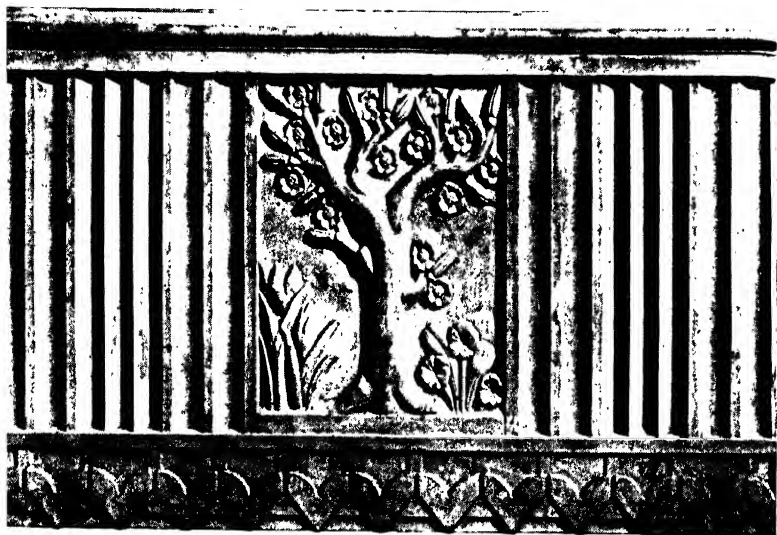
Cast iron window breast panel for Lothian House, Edinburgh. Architect: Stewart Kaye, A.R.I.B.A. Sculptor: Pilkington Jackson. The association of cast iron panels with metal framed windows is shown on Plate 13 and opposite: in both examples, as well as above, the decorative possibilities of the material have been appreciated and used with restraint.
